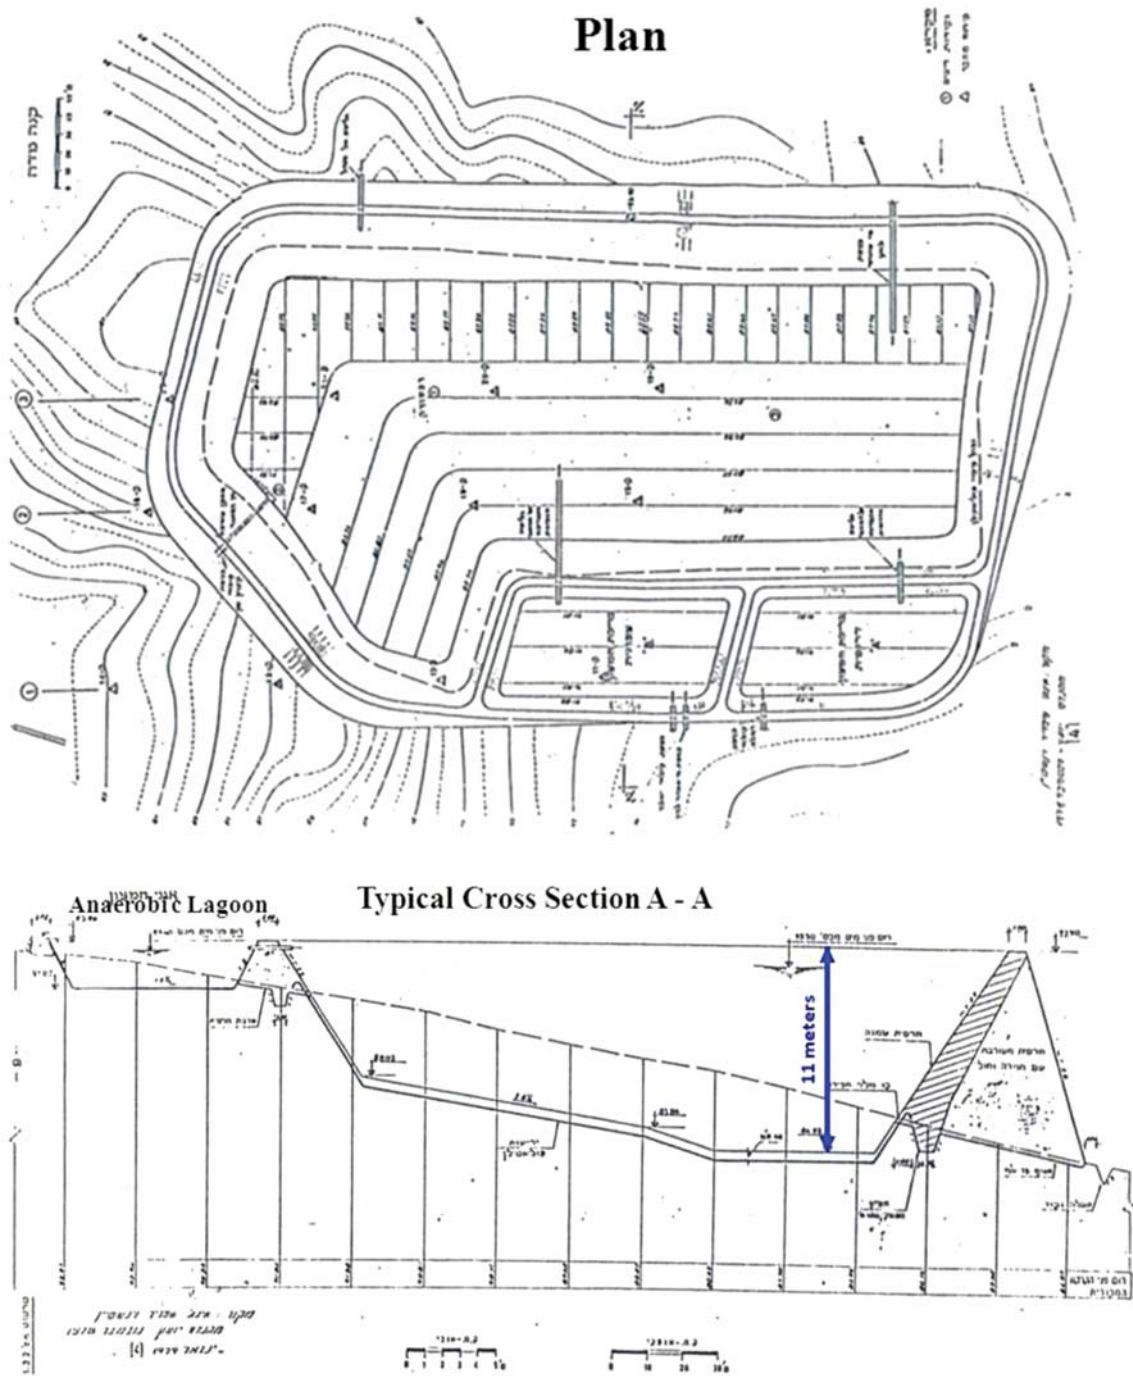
Plan and section of a typical stabilization reservoir system with pretreatment by anaerobic lagoons (Source: Tahal 1981)
